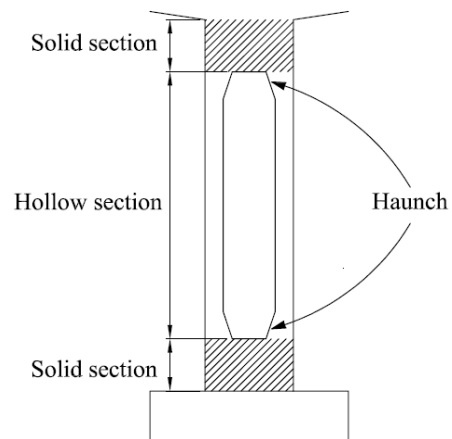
Design recommendations for reinforced concrete bridge columns with hollow section
